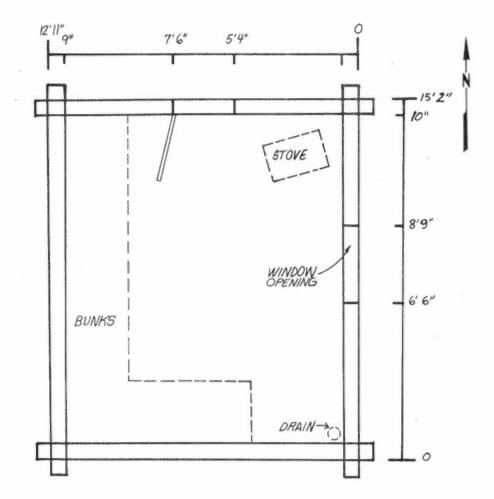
FLOOR PLAN - 10 MILE REINDEER CABIN
